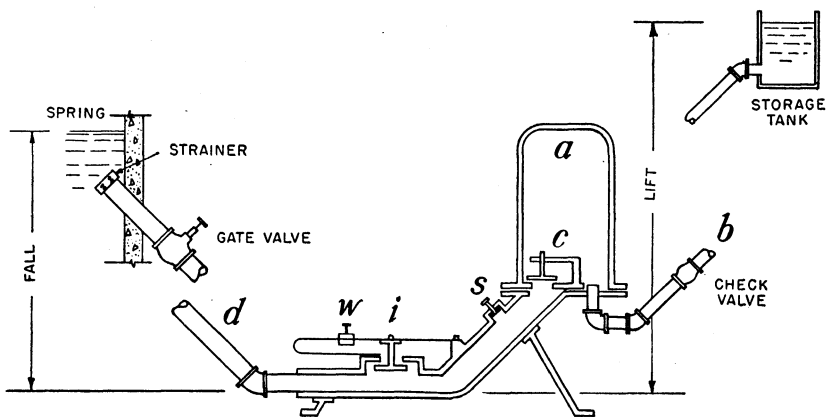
Hydraulic ram: a, Air chamber; b, delivery pipe; c, check valve; d, drive pipe; i, impetus, or waste, valve; s, sniffer valve; w, movable weight.
